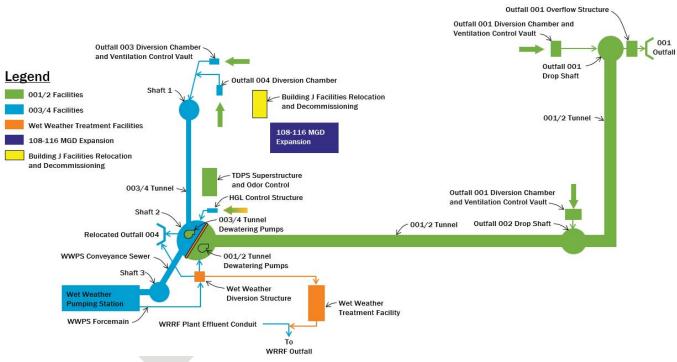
Schematic of Diversion Sewers to 001/2 Tunnel
